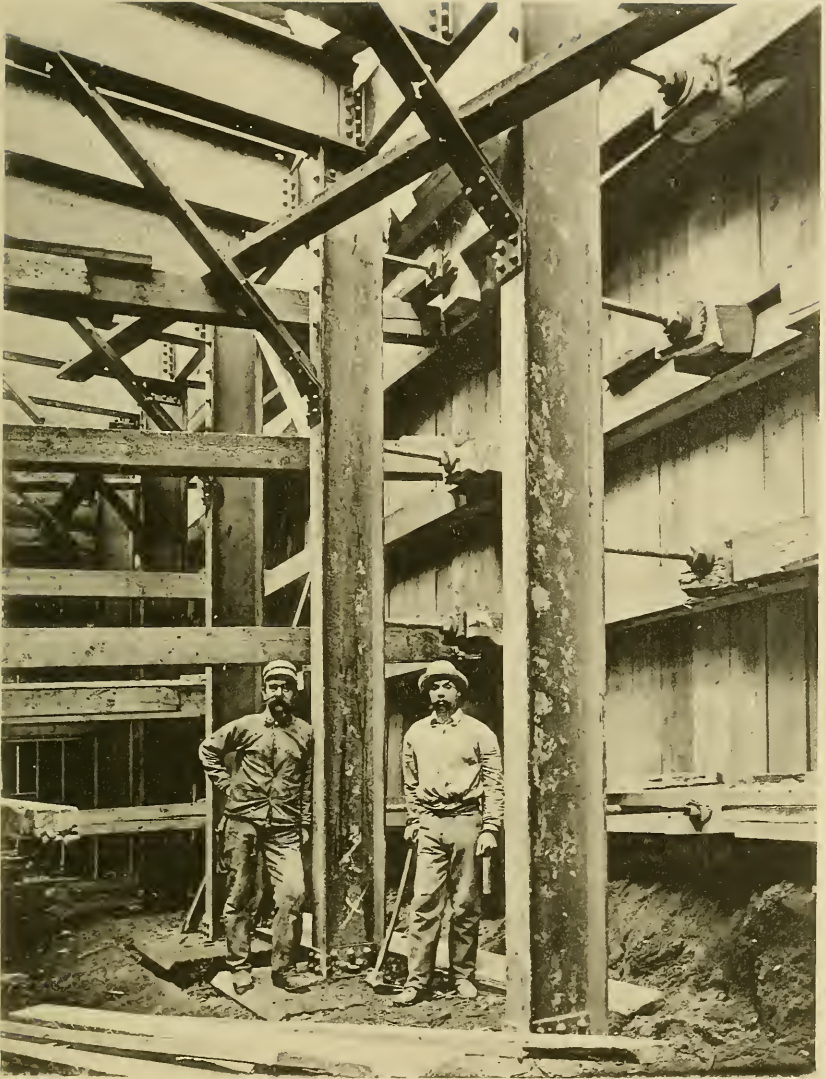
SECTION 1, BOSTON COMMON, BOYLSTON-STREET MALL. ERECTION OF STEEL-WORK OPPOSITE BOYLSTON PLACE. October 28, 1895.
